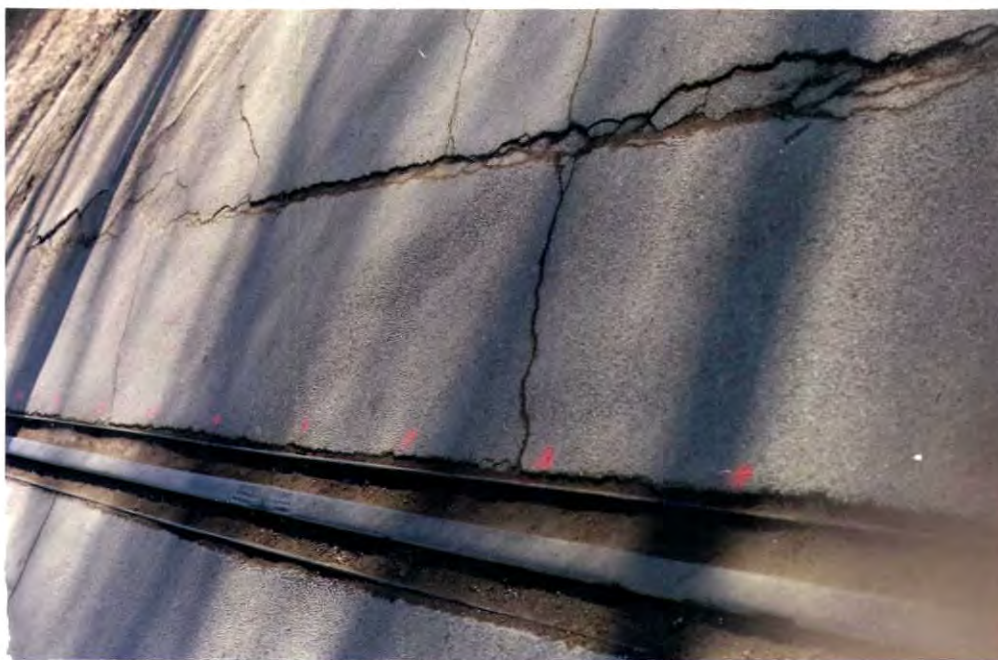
Kemp Avenue - Pavement Failure at End of Tie
